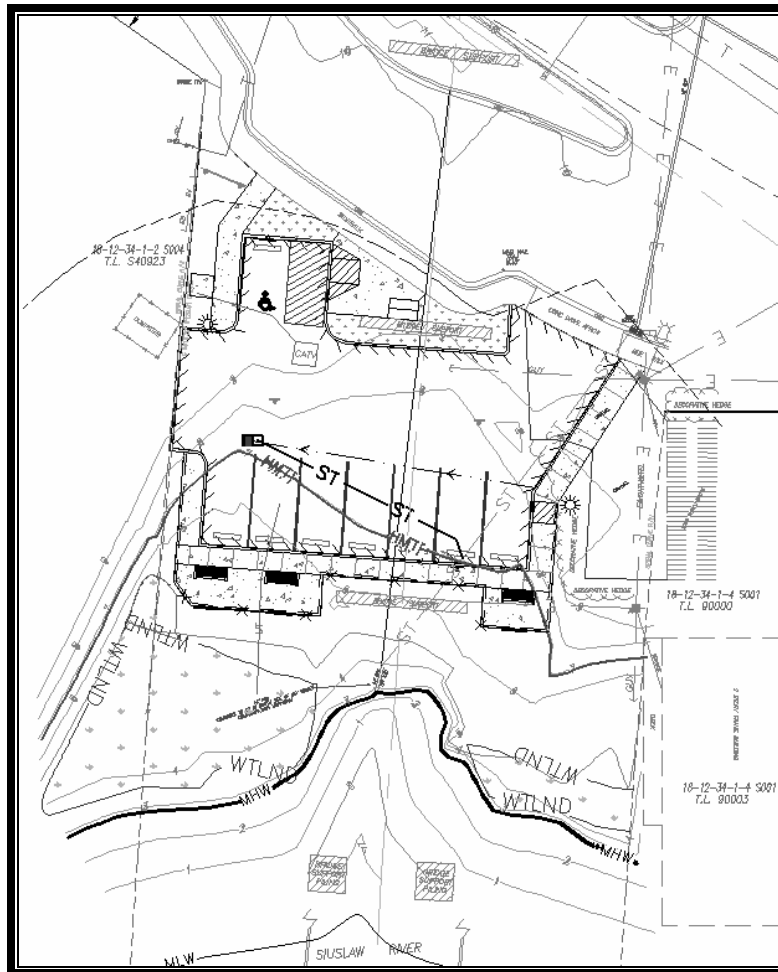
Proposed Siuslaw Interpretive Site & Wayside West
